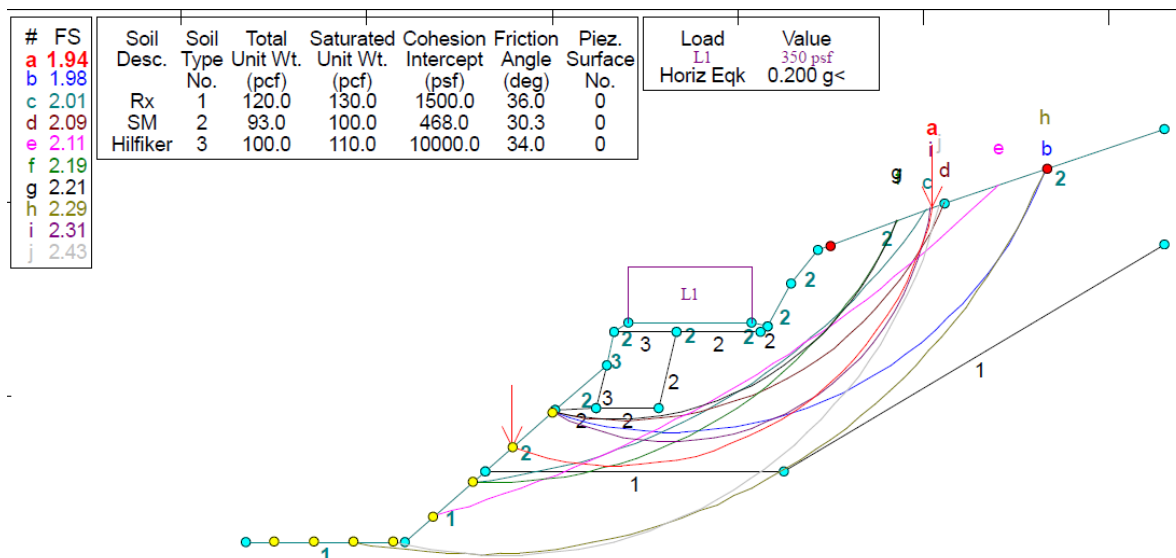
Global Stability Calculations for the Wall at Italian Bar Road Site 6
